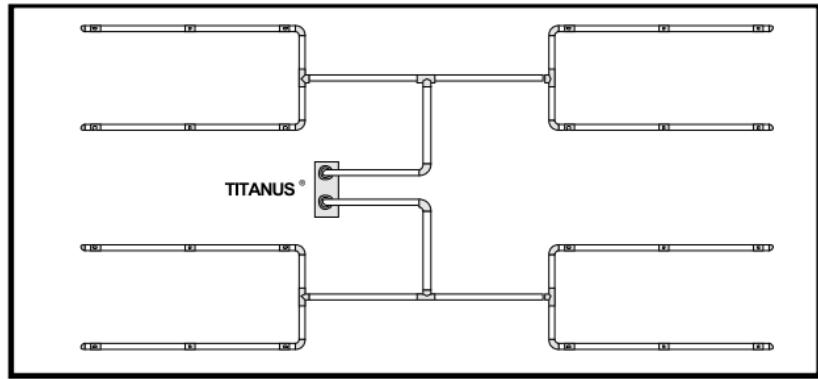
Double U-pipe system, e.g. for equipment protection
